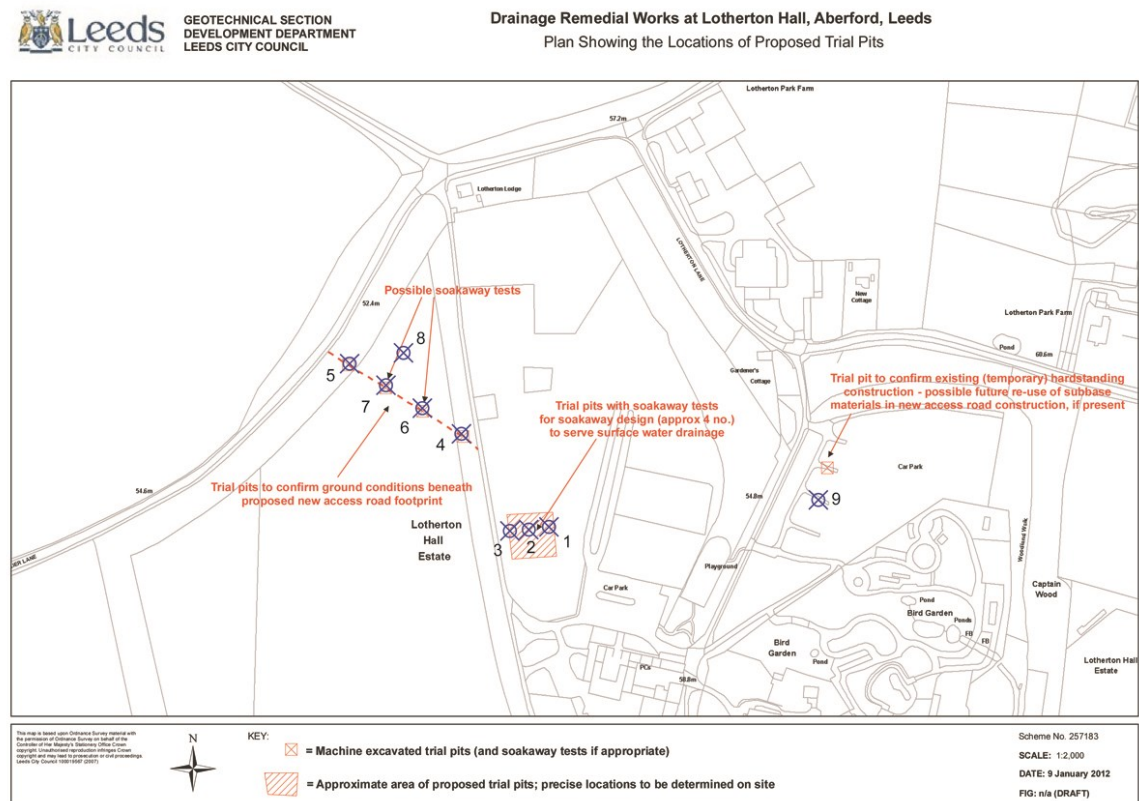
Test pit locations (in blue) and initial geotechnical plan
